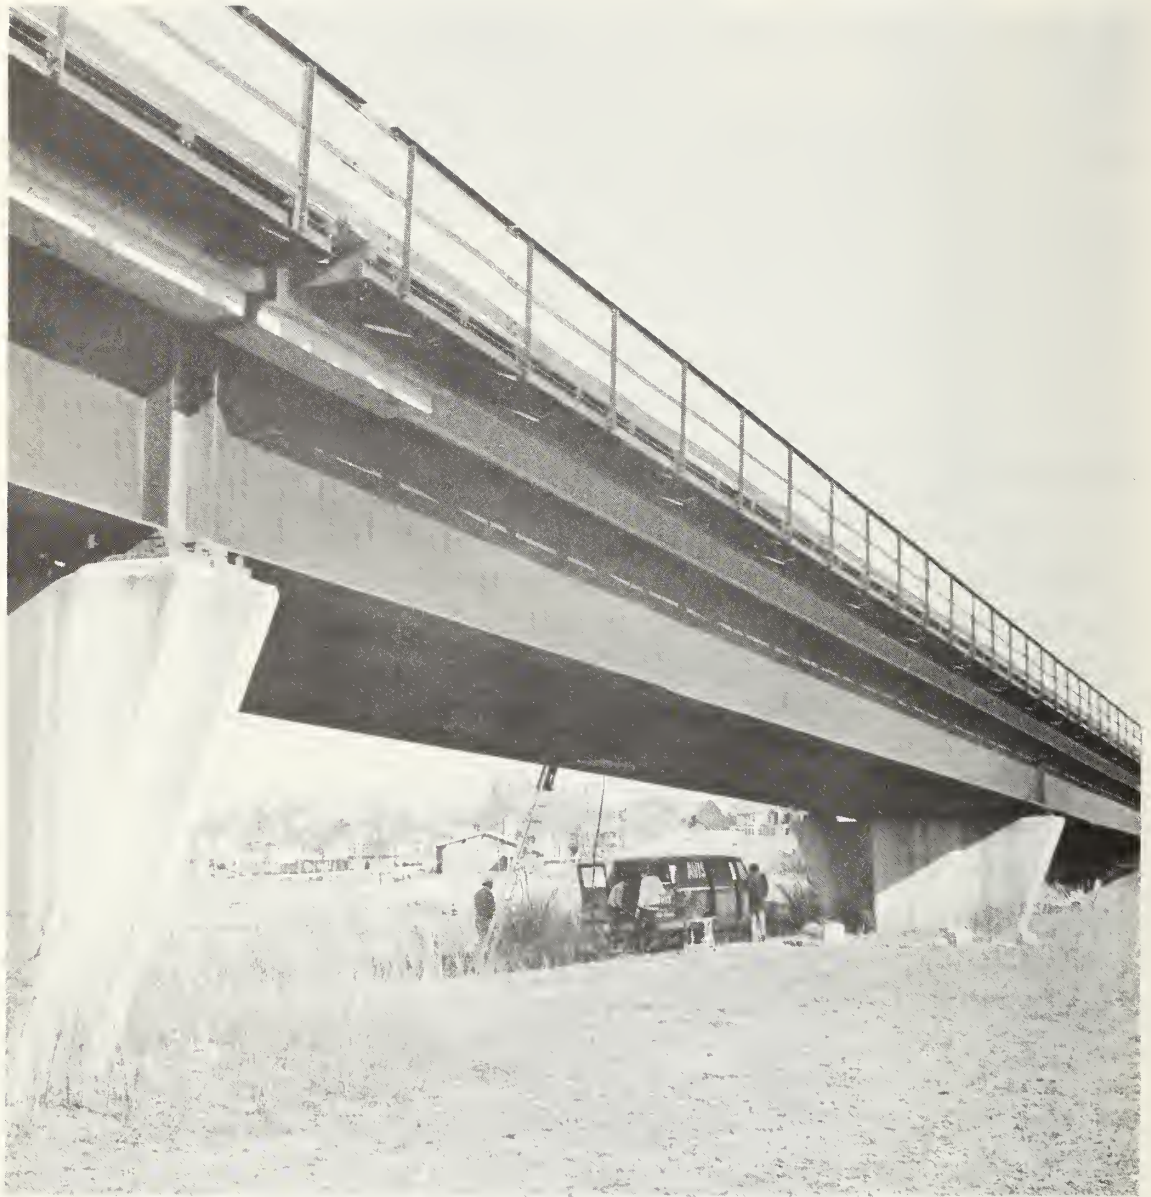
TYPICAL STEEL PLATE-WEB GIRDER, CONCRETE SLAB
